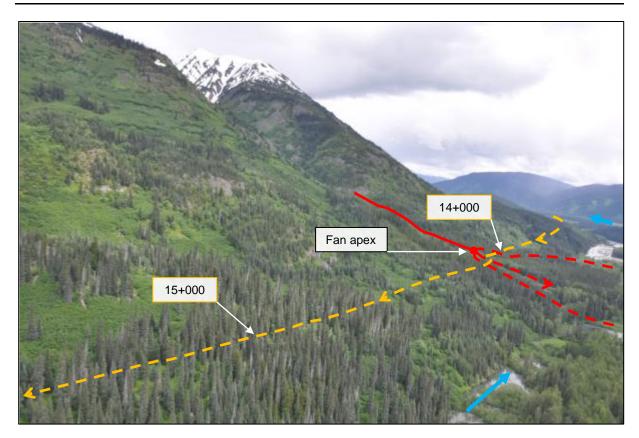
Treaty Creek Access Road – Looking upchain (southwest) from Highway 37 with the proposed Bell-Irving River bridge crossing in the foreground.
